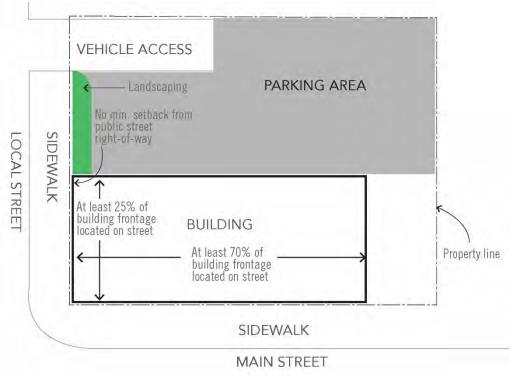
B. Building Placement and Location of Parking, Main Street/Local Street Intersection (typical)
